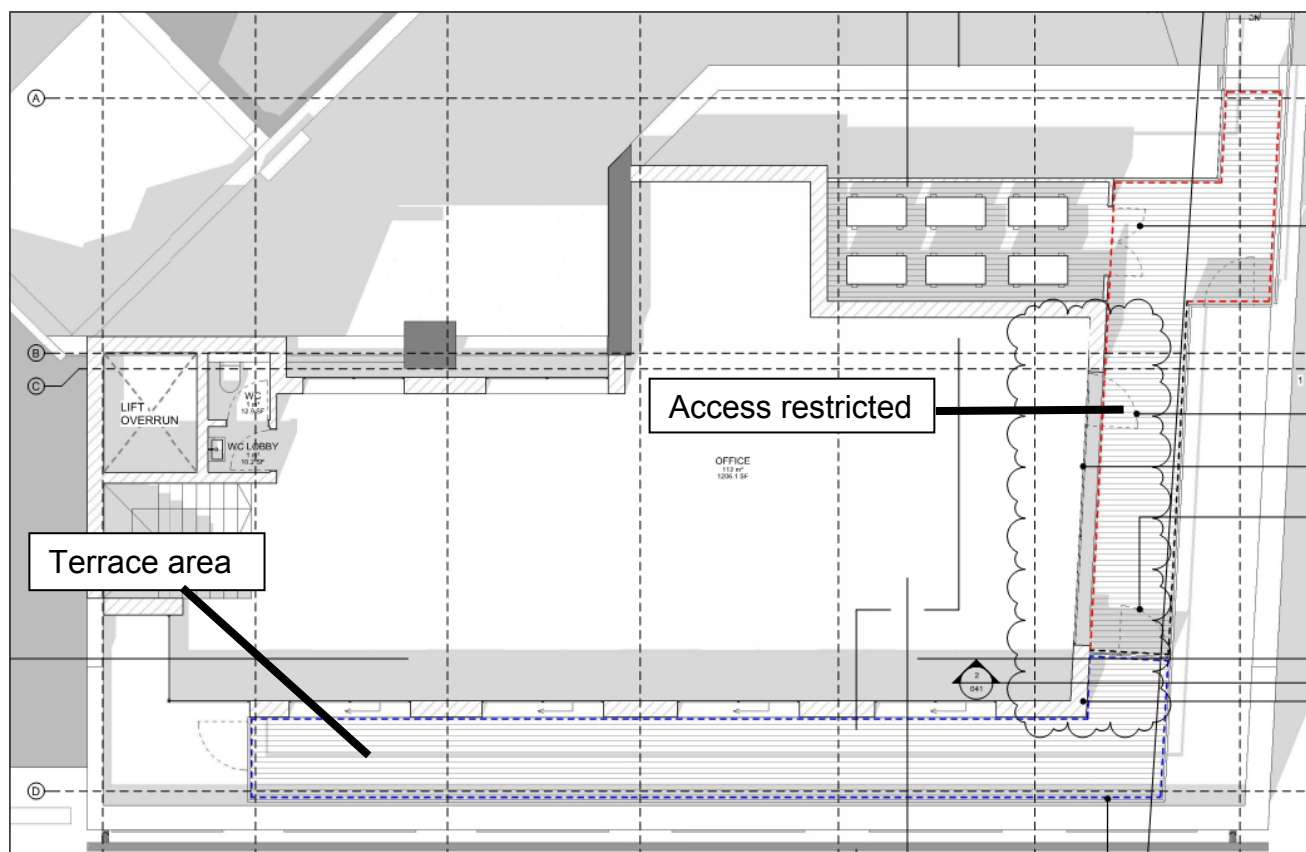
Section of flat roof area to be used as a terrace (dashed in blue)
